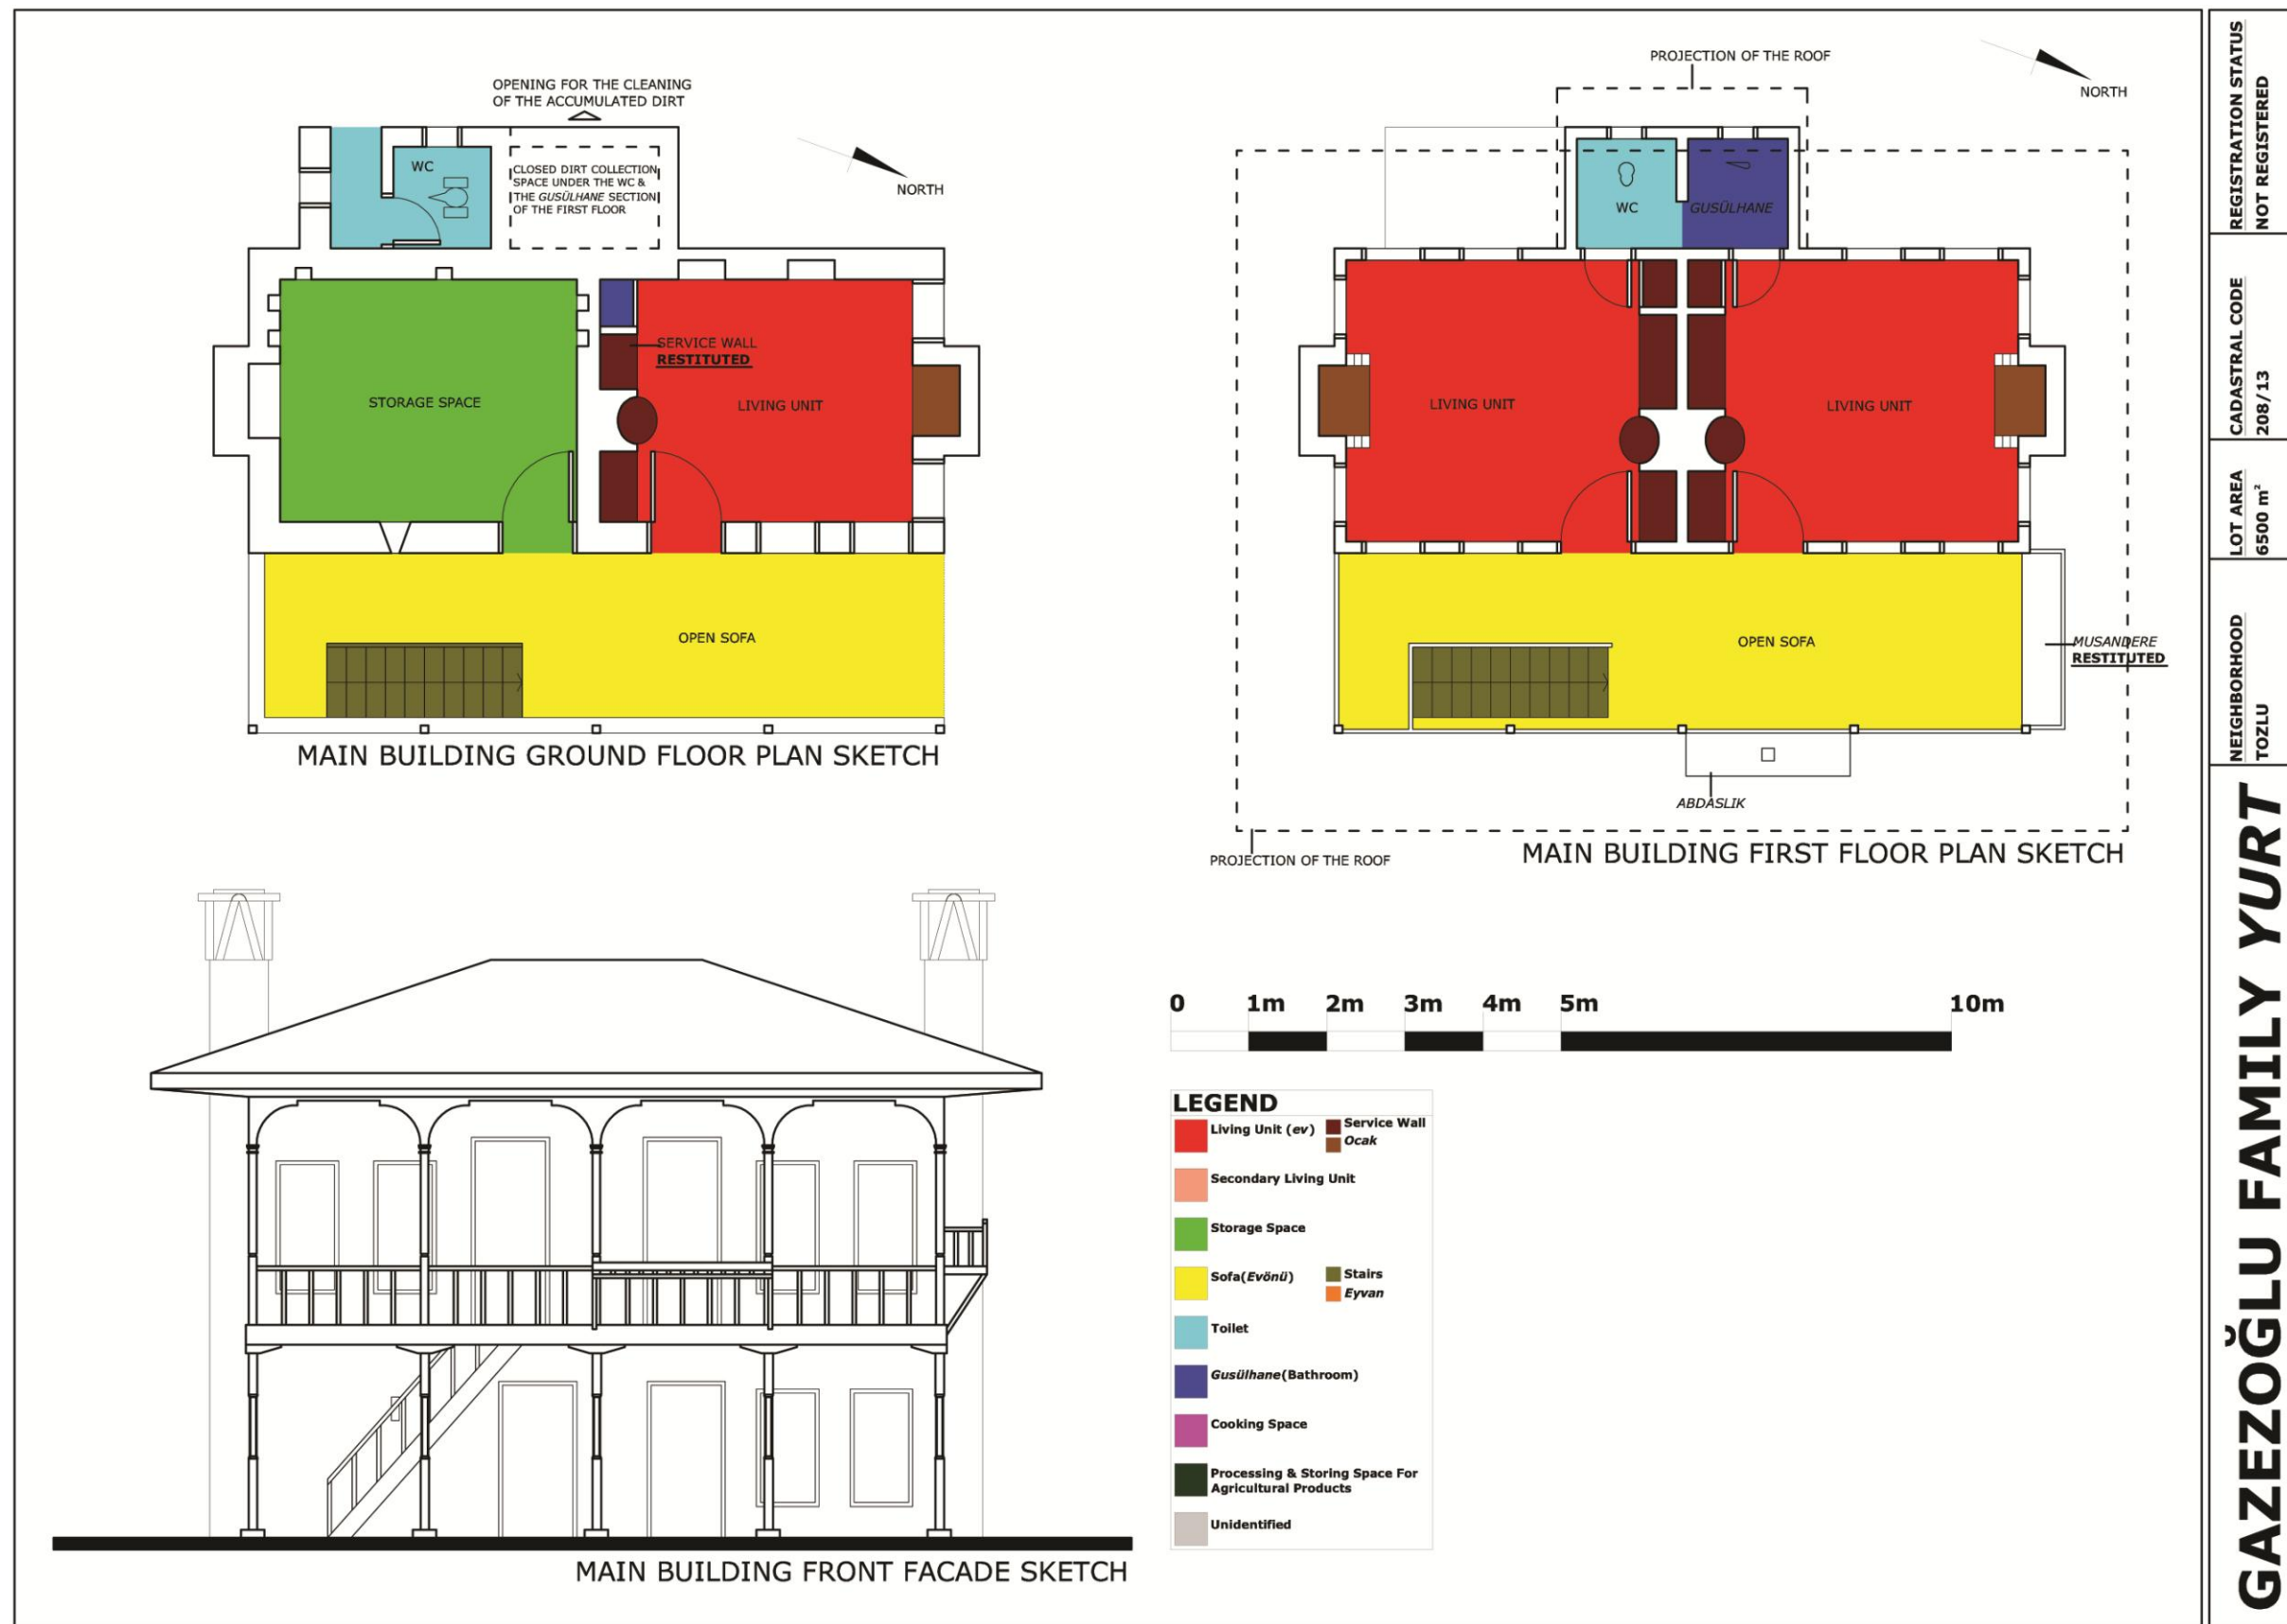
Plan and front façade sketches of the traditional building *in the yurt* of Gazezoglu Family
